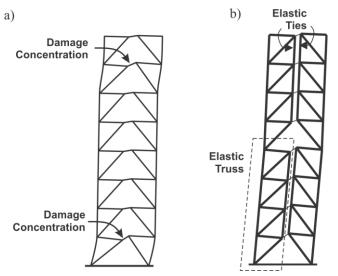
Deformed shape of an 8-storey structure: a) Conventional EBF; b) SESBF with 2 four-storey trussed spine segments.
